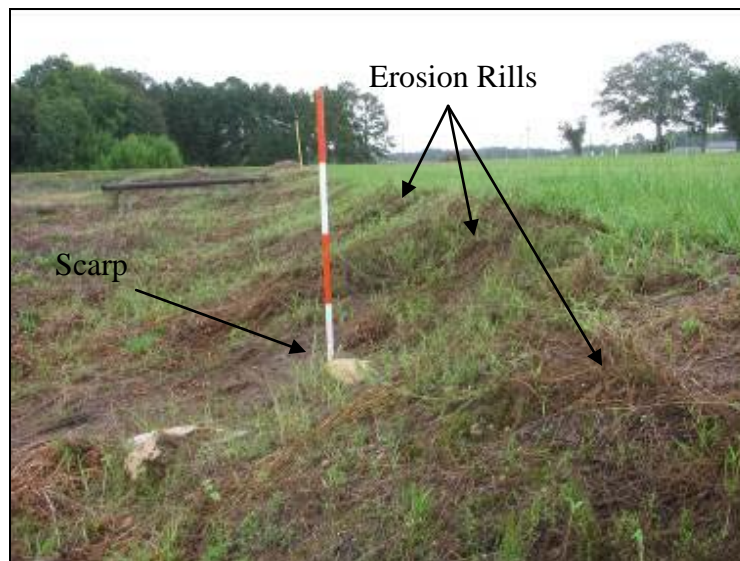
Ash Pond – Southeast embankment interior slope, looking northeast. Note: erosion rills and surficial scarps.
